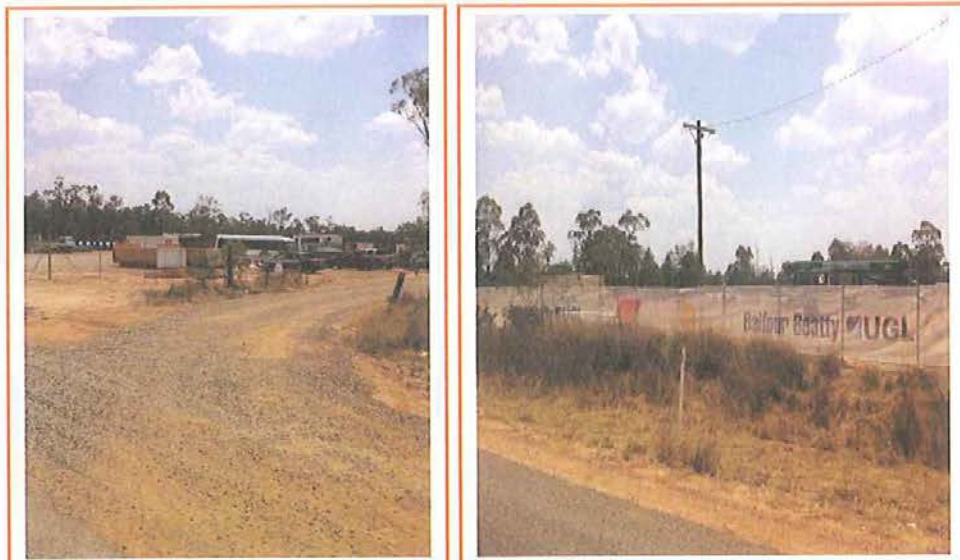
Equipment Storage Place and Summit Tower Hire Businesses
